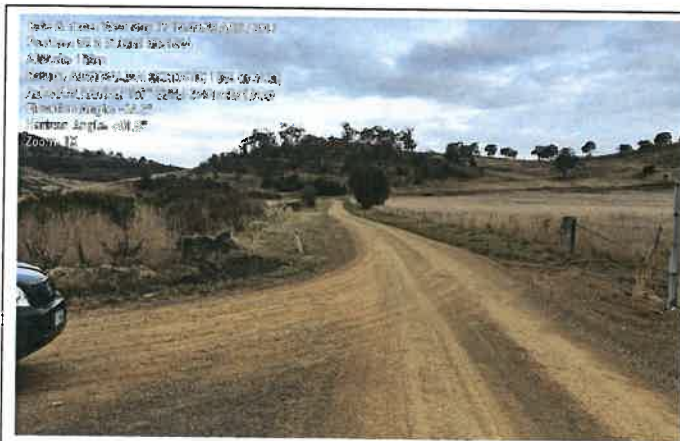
ACCESS ROAD JUNCTION LOOKING SOUTH
